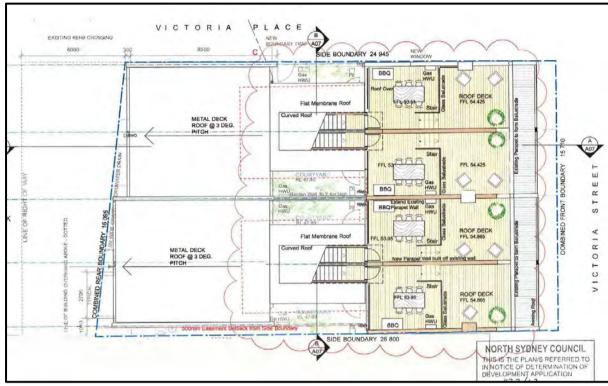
Approved roof and outdoor terrace (deck) level with dining and BBQ area for existing attached residences
